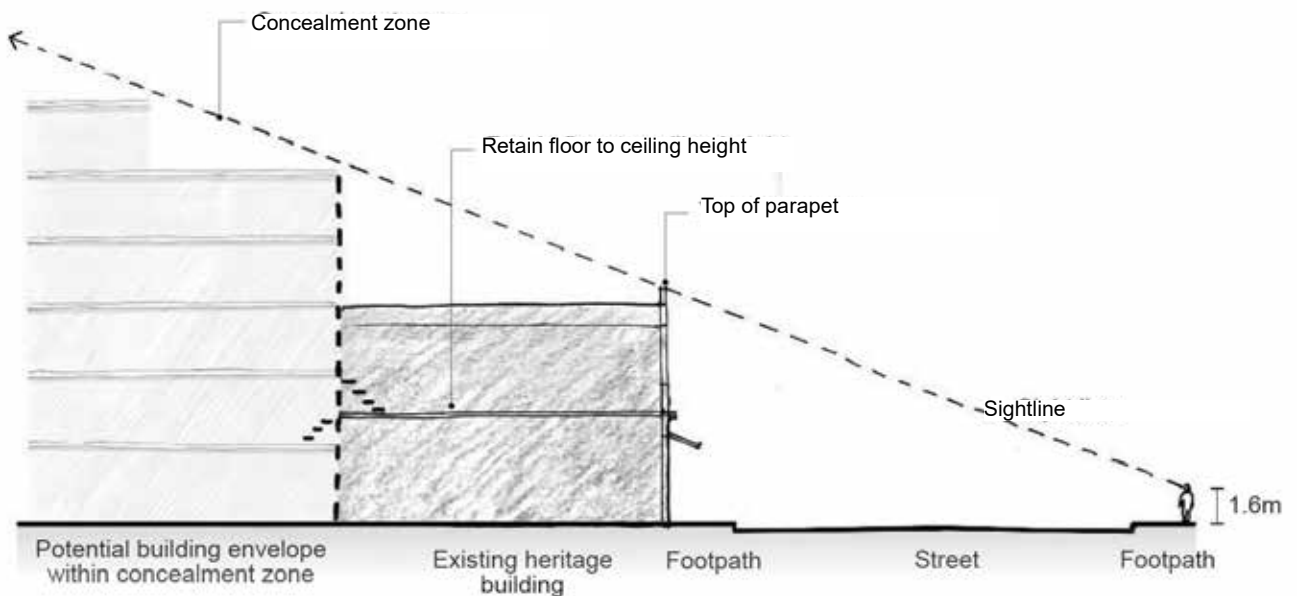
Sightline to achieve full concealment to a Significant building or any double-storey building within a consistent streetscape.
